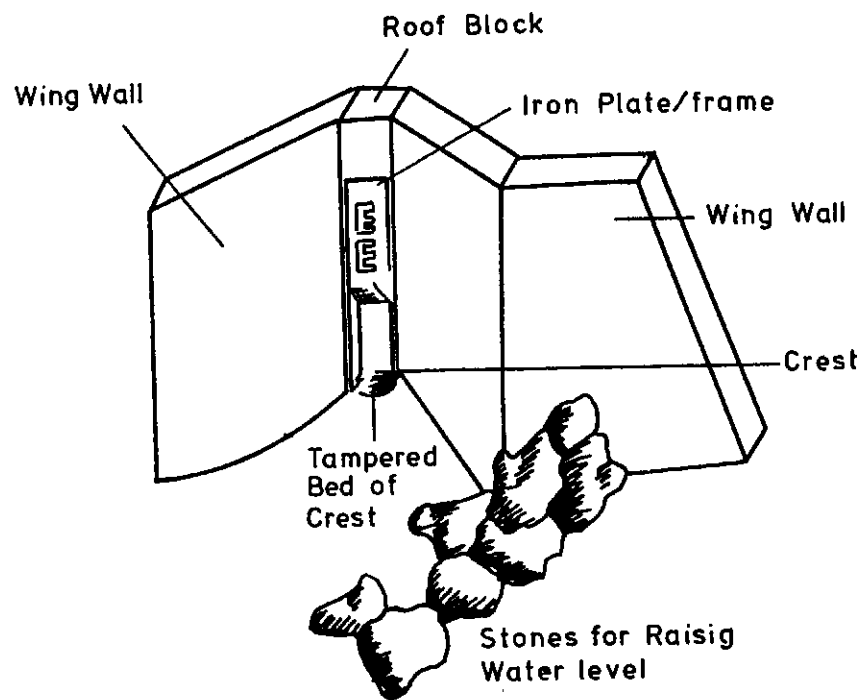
Typical view of tampered crest of the outlet numbers 3L, 4L, 5L, 6L and 8L.
